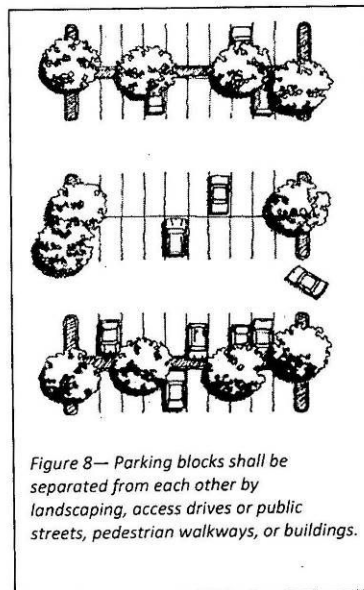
Parking blocks shall be separated from each other by landscaping, access drives or public streets, pedestrian walkways, or buildings.
